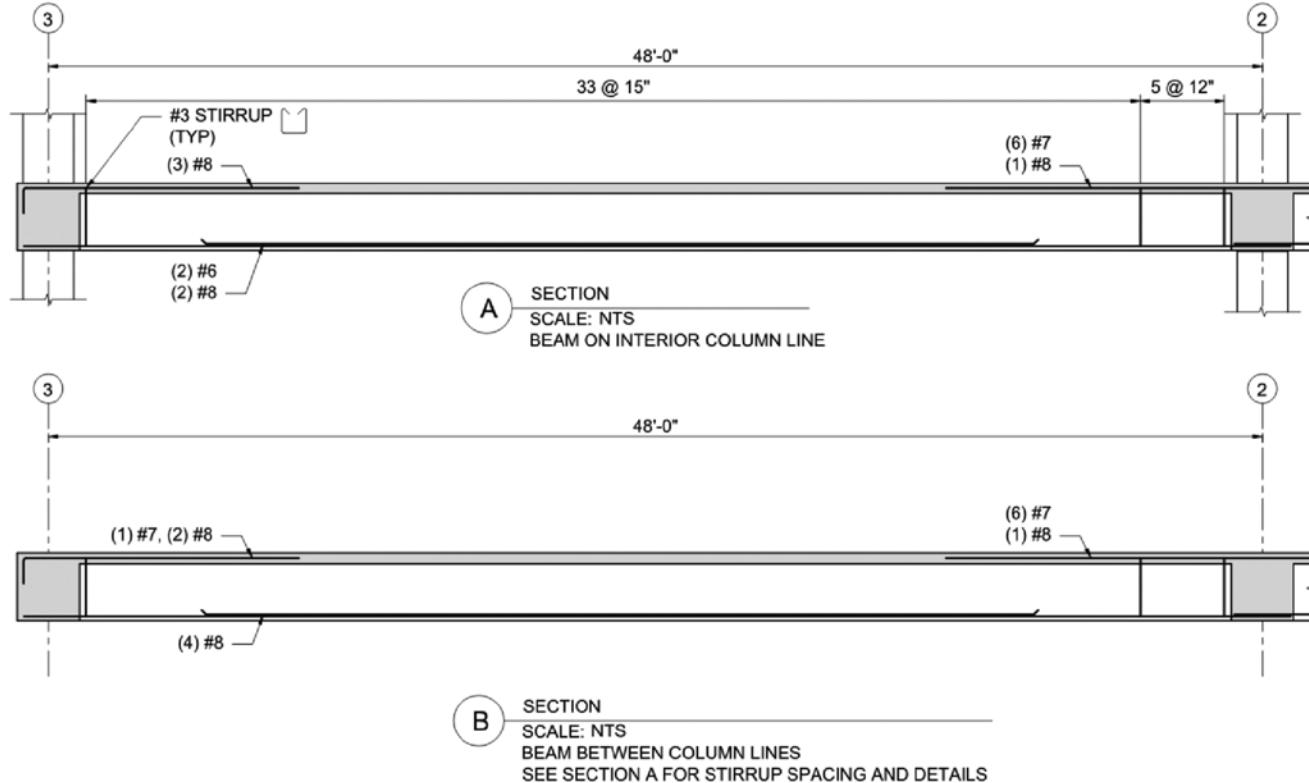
NS beam longitudinal sections and reinforcement (Fig. 6.1b in Reference 3)
